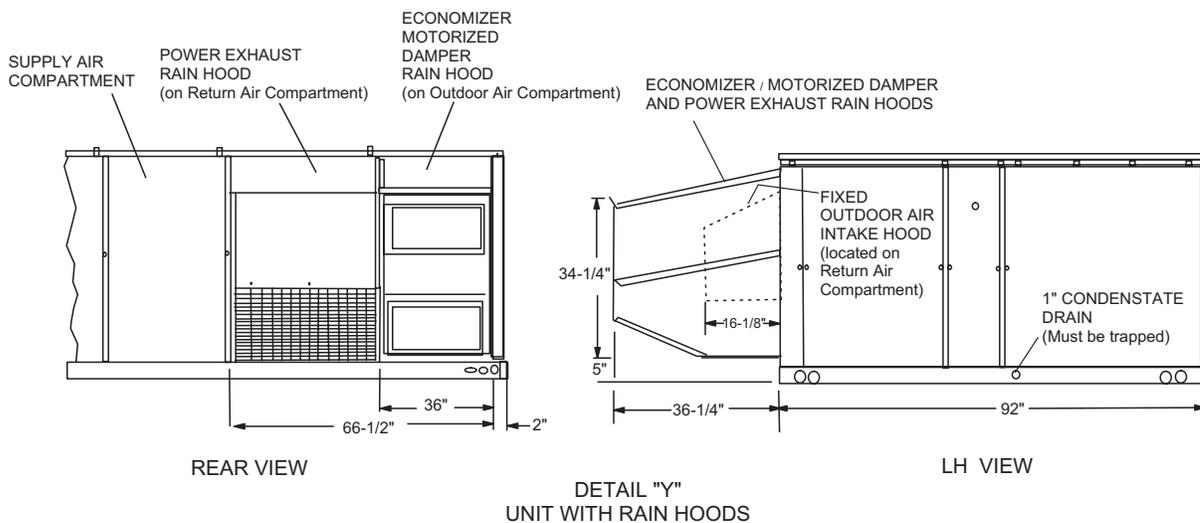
UNIT DIMENSIONS DHE/DHG180 & 240 (RAINHOOD)
